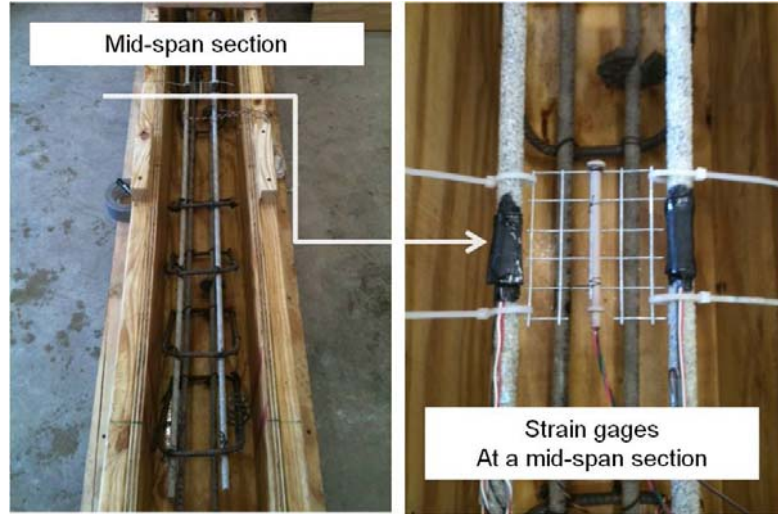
Typical instrumentation of strain gages at a mid-span section
